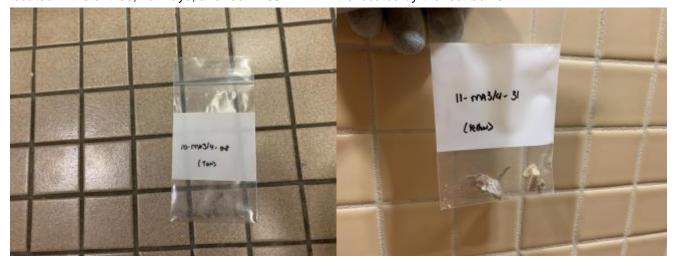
HA 10, 2" x 2" tan ceramic floor tile located in the restrooms.
